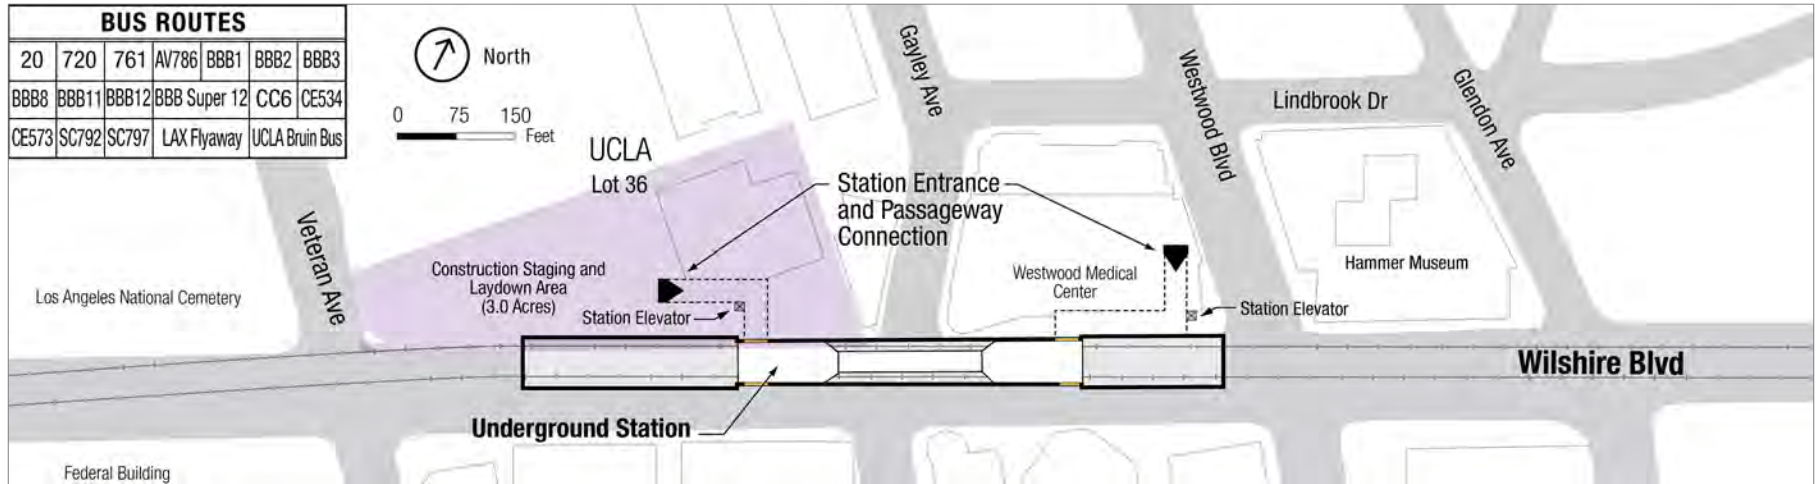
Westwood/UCLA On-Street Station—North of Wilshire
